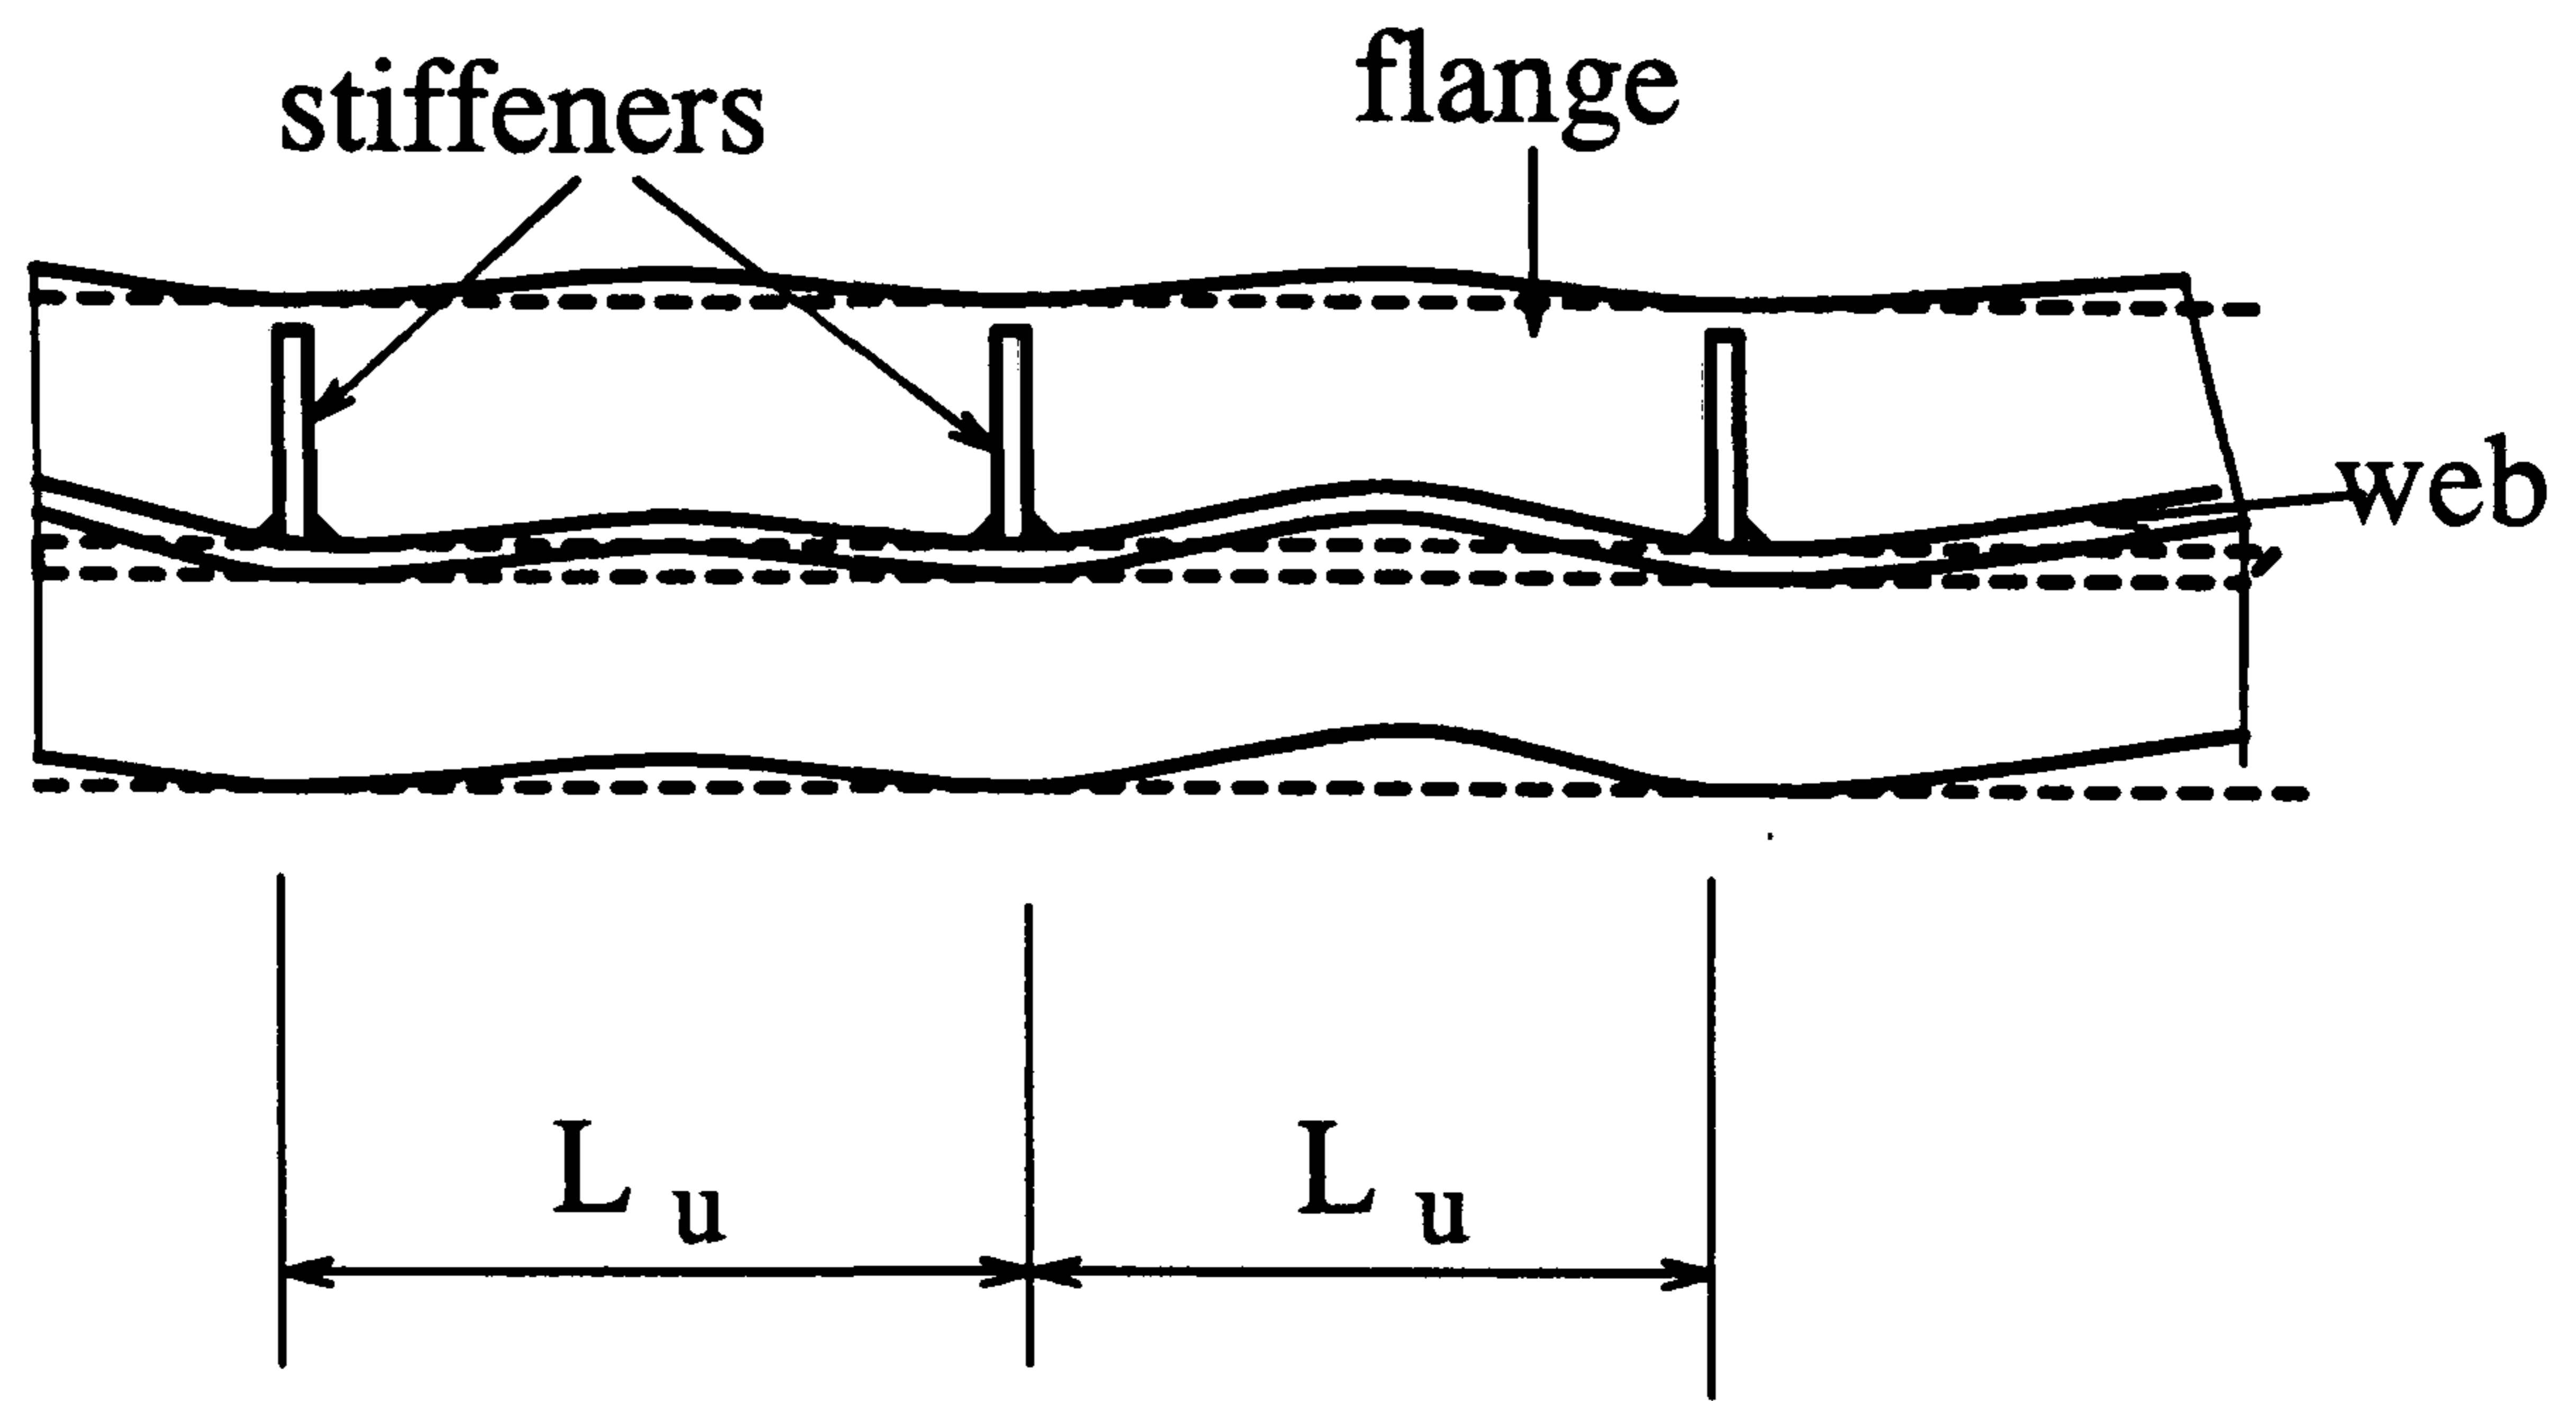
Initial imperfection in a welded bottom flange
